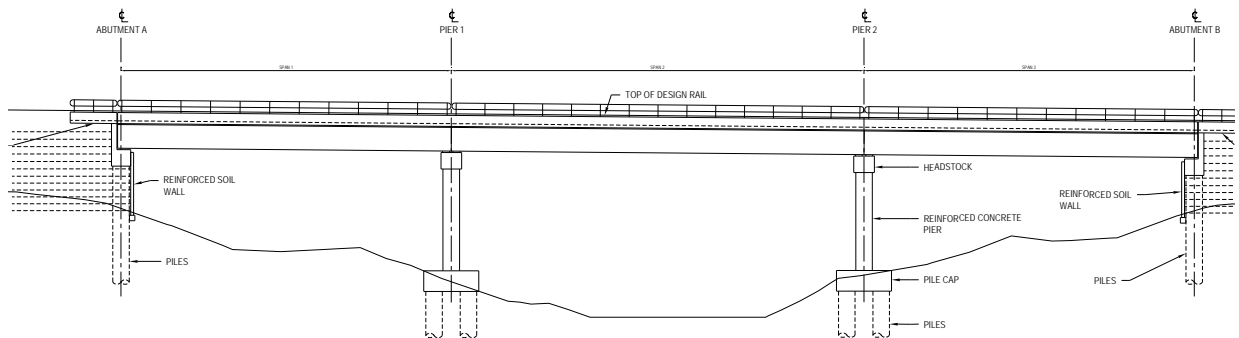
New Black Creek Underbridge Schematic: Elevation
